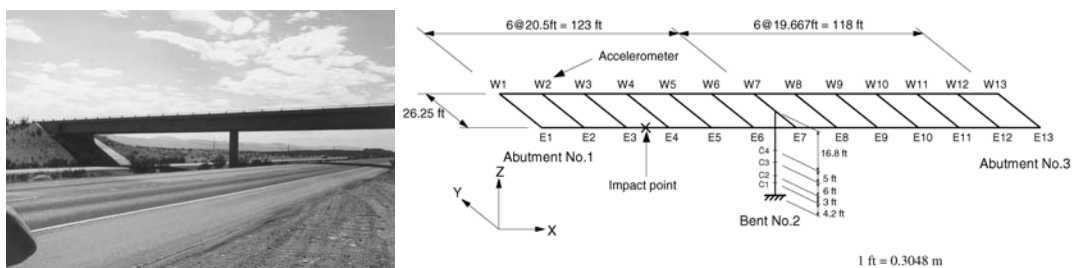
Concrete box girder bridge studied by Park et al. (2001): a) view; b) accelerometer locations.
